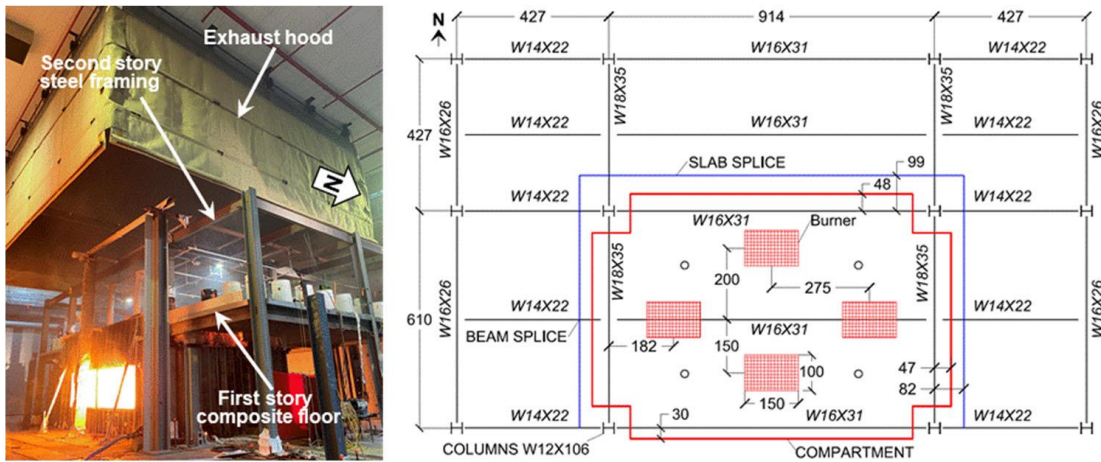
Two-story test frame and plan view of the test frame on the first floor. (Ramesh, *et al.*, 2022)
